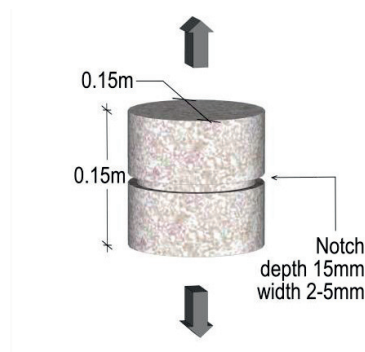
Dimensions of specimens for uniaxial tension testing.
